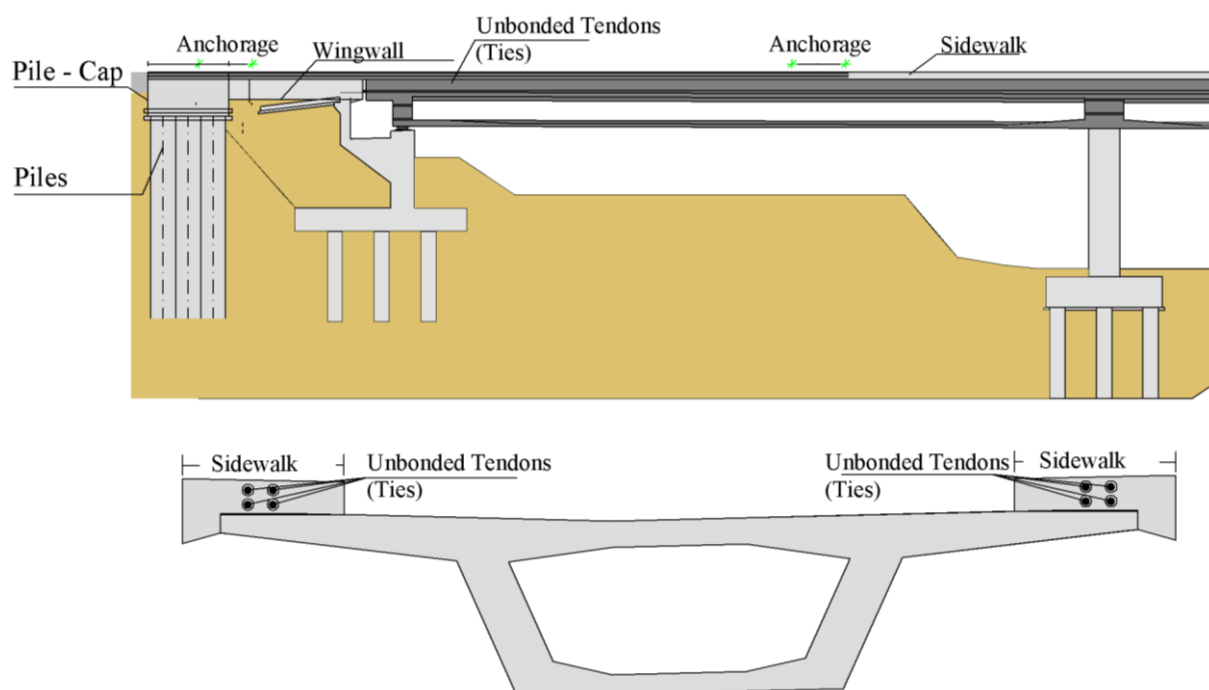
Restraining System. a. Longitudinal view of the bridge, b. Detail 1: cross section of the deck of the bridge
